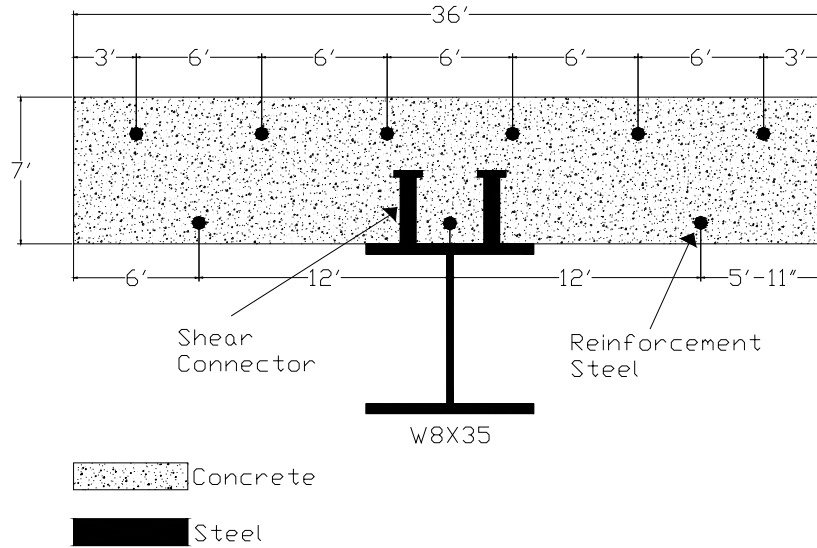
Transverse View of Test Specimen, with Reinforcing Steel Layout
